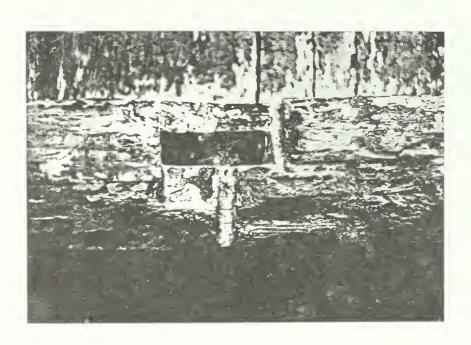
West India Goods Store, interior of second story, east wall looking east, post between bays B and A, showing cut made to accept possible partition framing.
